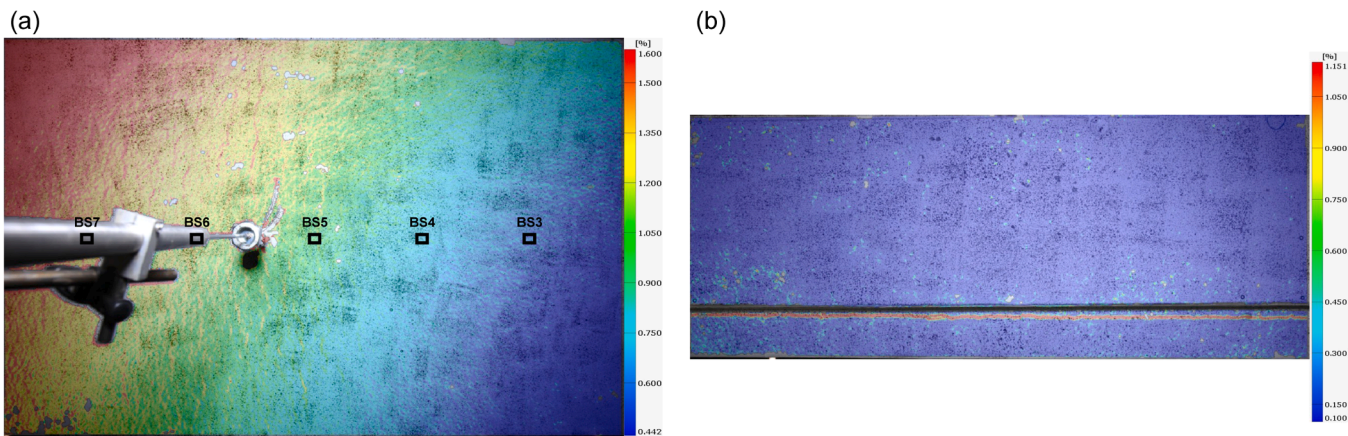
DIC images on the beam during the shear test at 390 kN. (a) Bottom surface. (b) Side surface.
